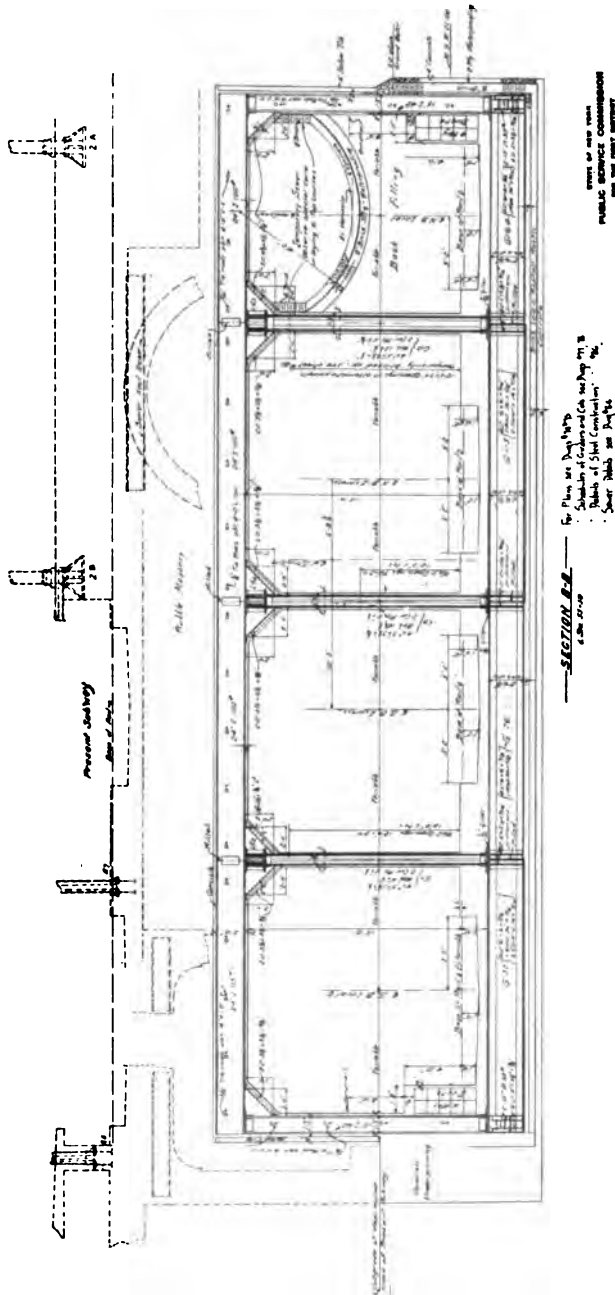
SECTION FROM ORIGINAL (STEEL BEAM) DESIGN FOR CROSSING UNDER ATLANTIC AVENUE STATION. NOTE TEMPORARY SEWER IN COMPLETED EAST TRACK OF NEW SUBWAY.
